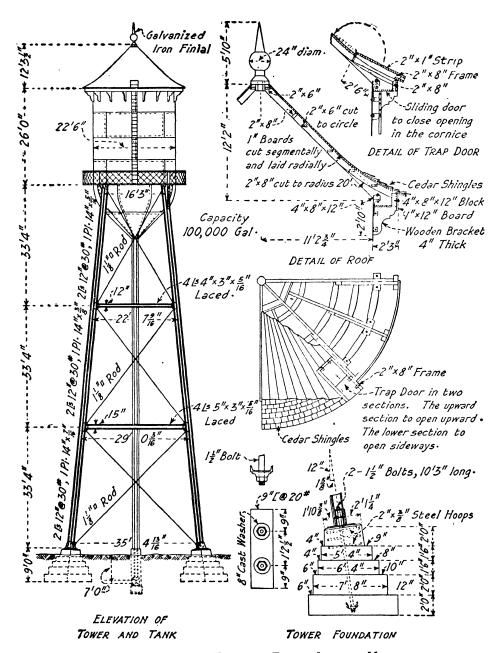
ELEVATED TANK AND TOWER, JACKSON, MINN.
